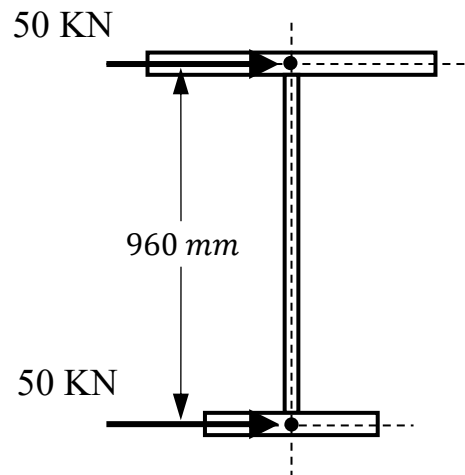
Horizontal parallel forces on top and bottom flanges
